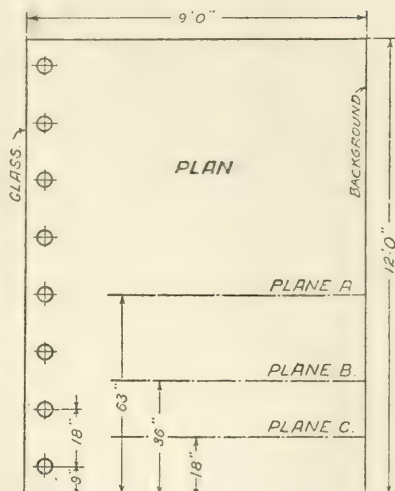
Plan of Class A window showing location of test planes and ceiling outlets.
